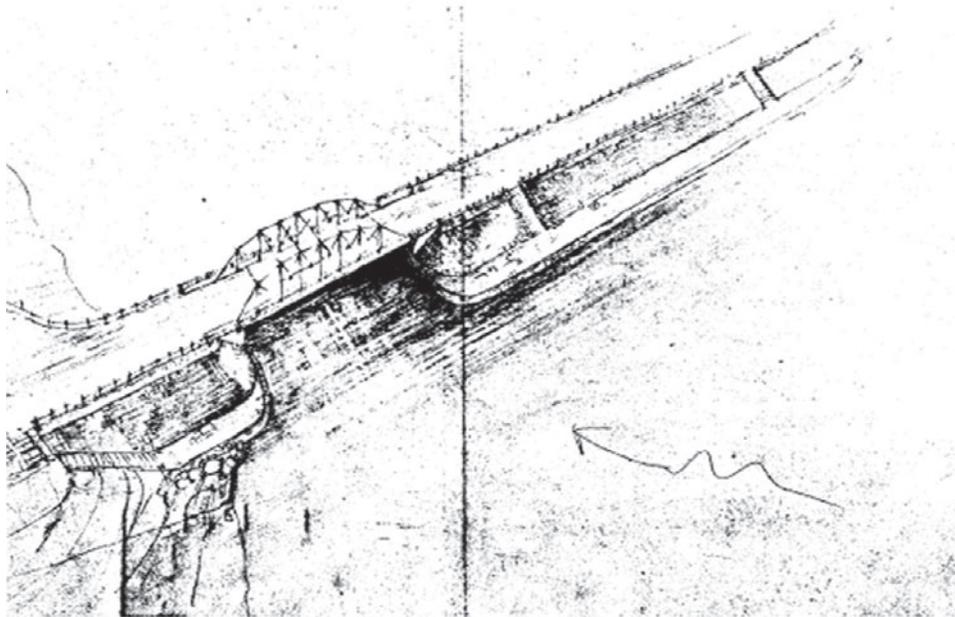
Detail from the original construction plans showing the Milan Bridge, the Highway 40 Causeway, the bridgeheads with the pedestrian terrace, and stone staircases. This plan sheet is photo-duplicated in this HAER documentation as photo MN-139-41 (see the Index to Photographs for more information).
